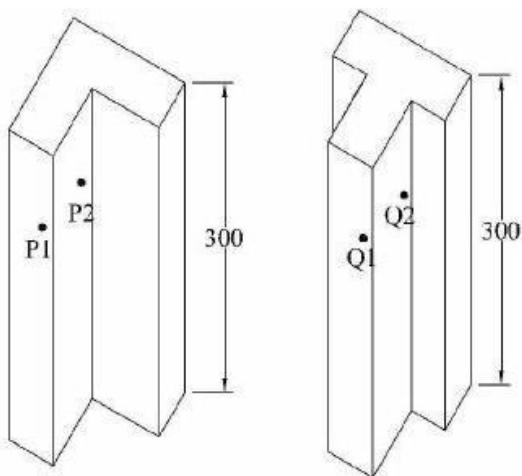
Plan of Building model of L-shaped building & T-shaped building respectively (J.A. Amin, A.K Ahuja, 2008)
